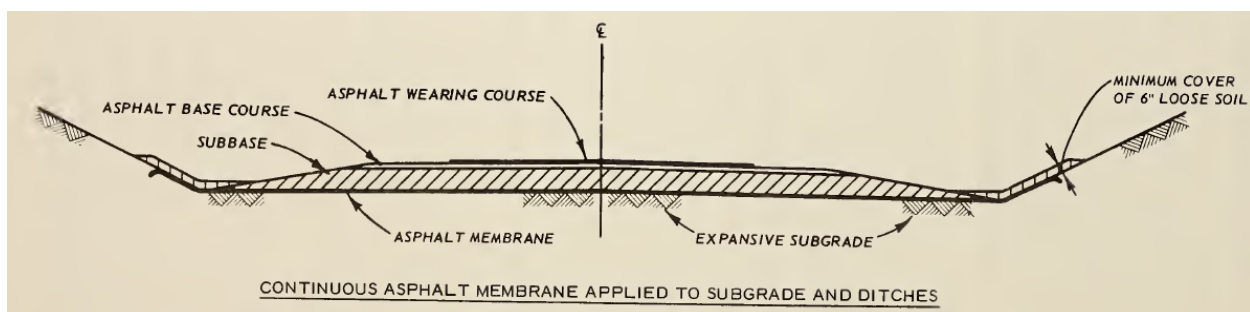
Detail of Asphalt Seal Extending to Roadside Ditch (Snethen 1979)
